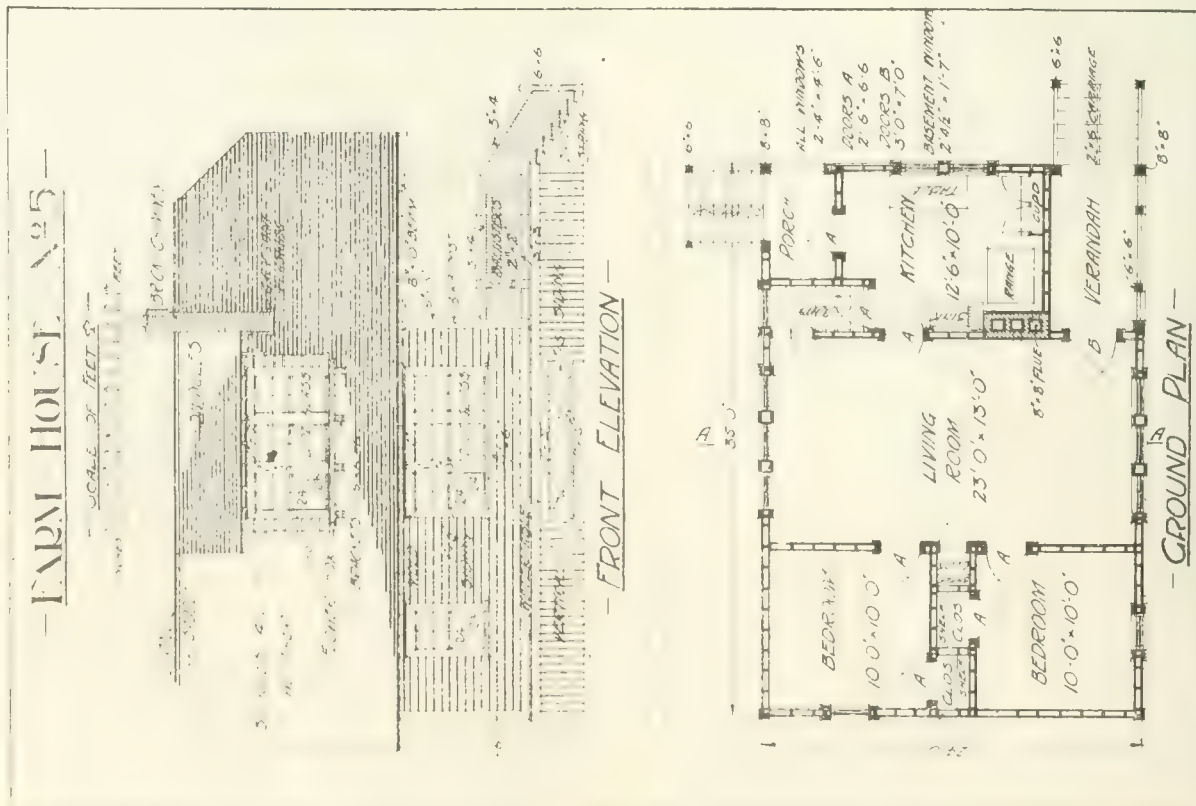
The living room, which will also serve as the dining room, is the central feature of the house. It extends across the whole width and has large windows facing front and back.
